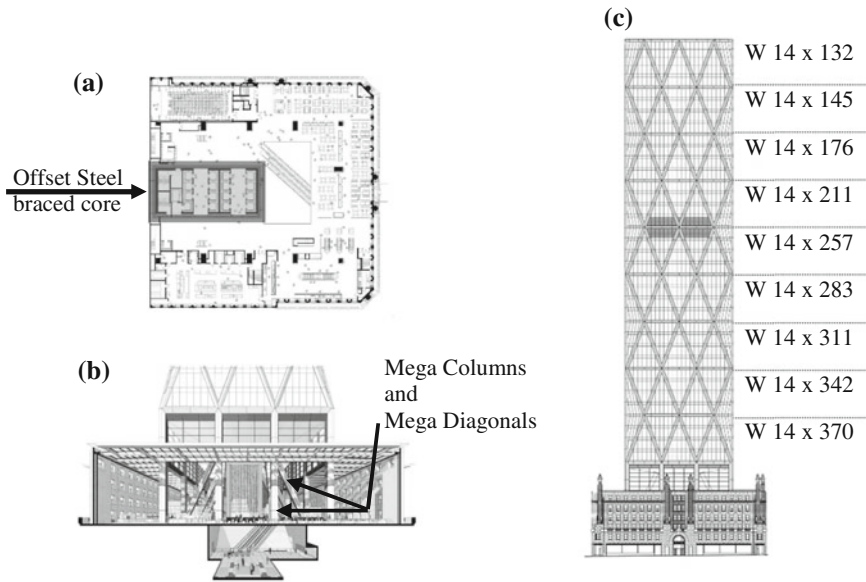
a Typical plan with offset steel braced core. b First floor with columns and mega diagonals, omitted for modelling. c Diagrid member section details [9]
